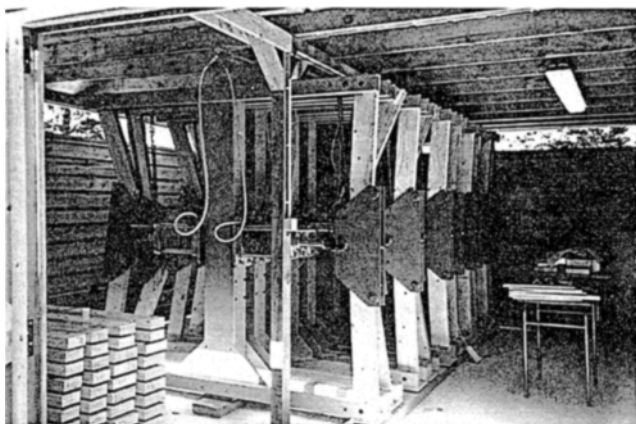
Loading frames at Lab 1, LRBB, for tests of small LVL beams at sheltered outdoor climate
